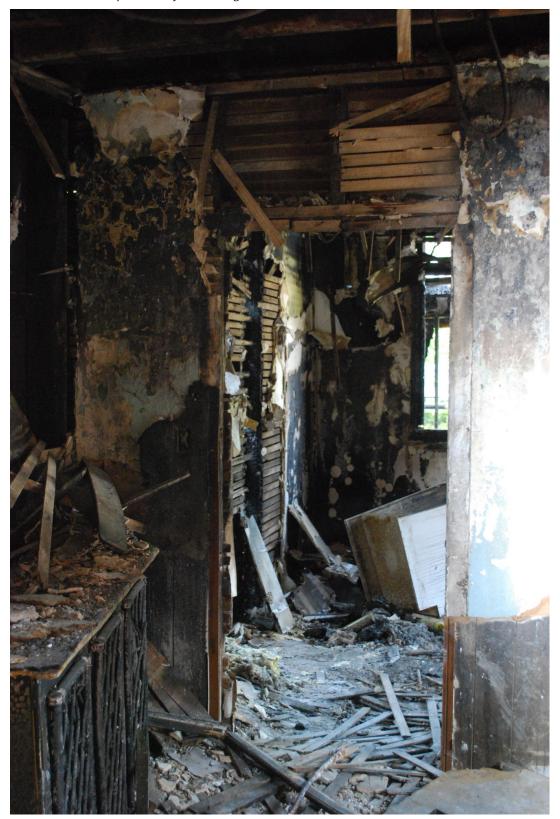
Cause and Origin Investigation Photo - Post Overhaul View from inside Addition into Quadrant A Bedroom
